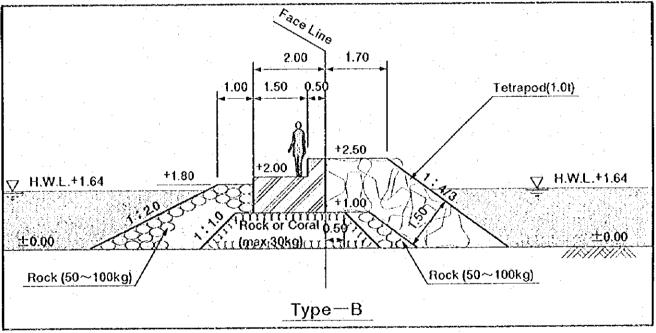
(2) Layout of Proposed Seawall(Gentle Slope Seawall)
